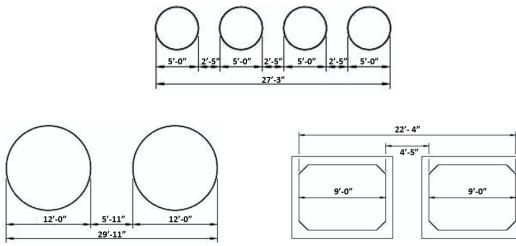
Examples of NBI Bridge Length Multiple Pipe
